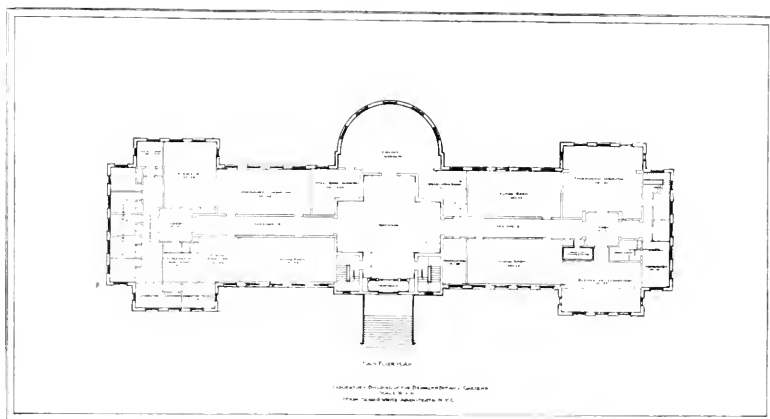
LABORATORY AND ADMINISTRATION BUILDING. Main floor plan.
